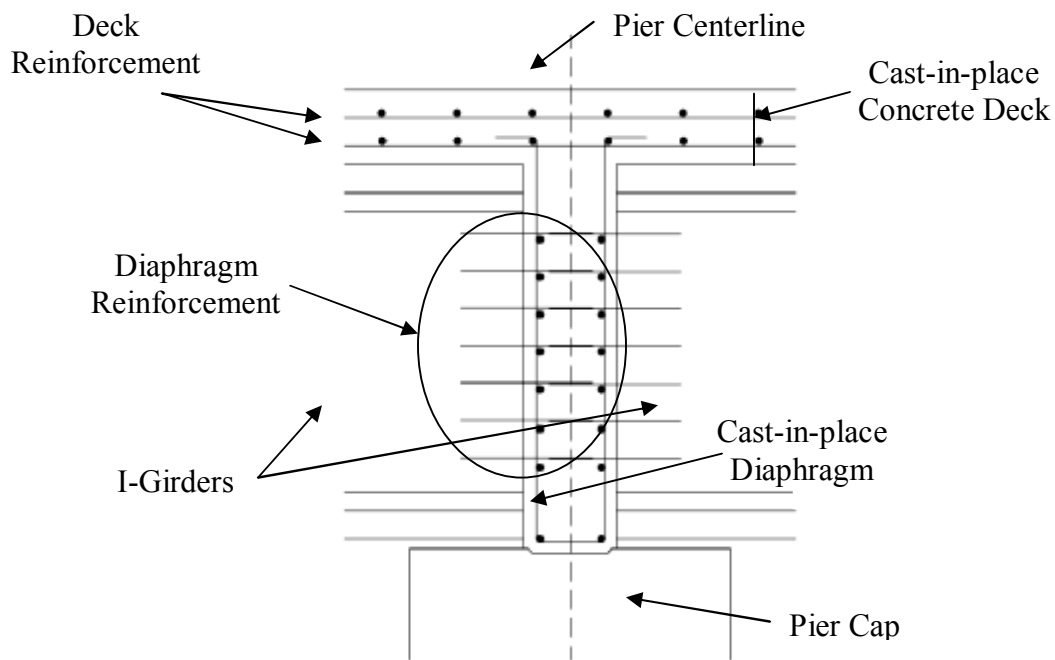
Interior joint detail of a precast concrete bridge girder made continuous using the Conventional Reinforcement Method (Saleh et al., 1995)
